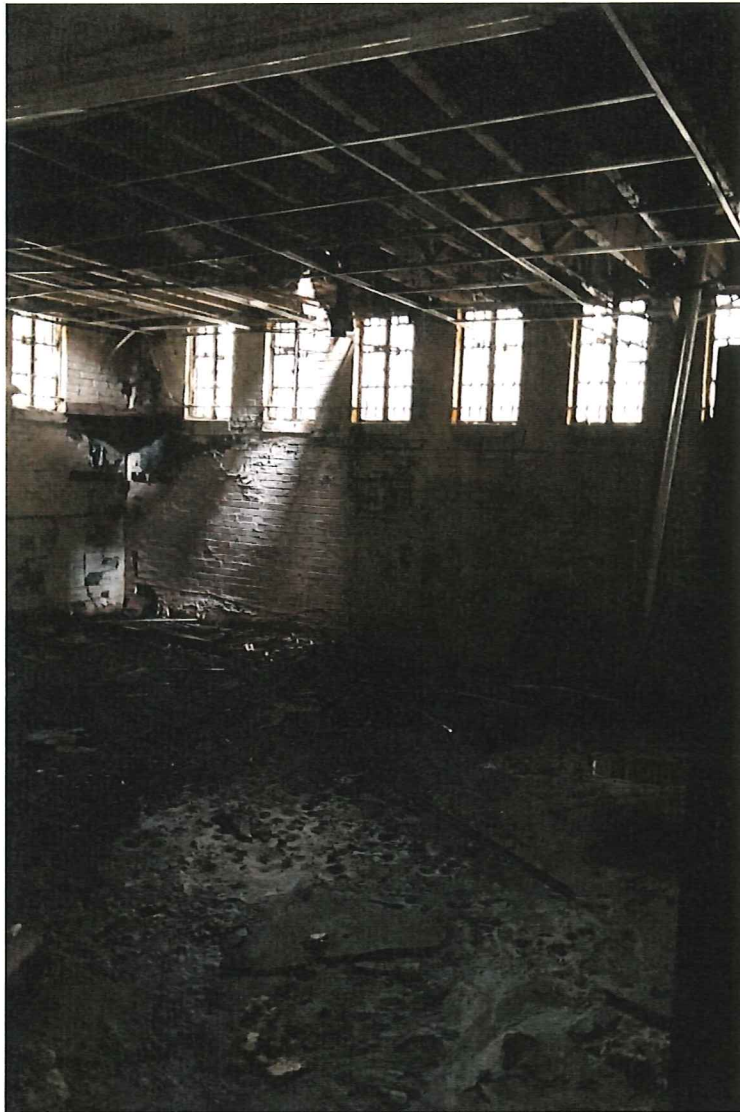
Northwest corner of administrative section, first floor, looking northwest
